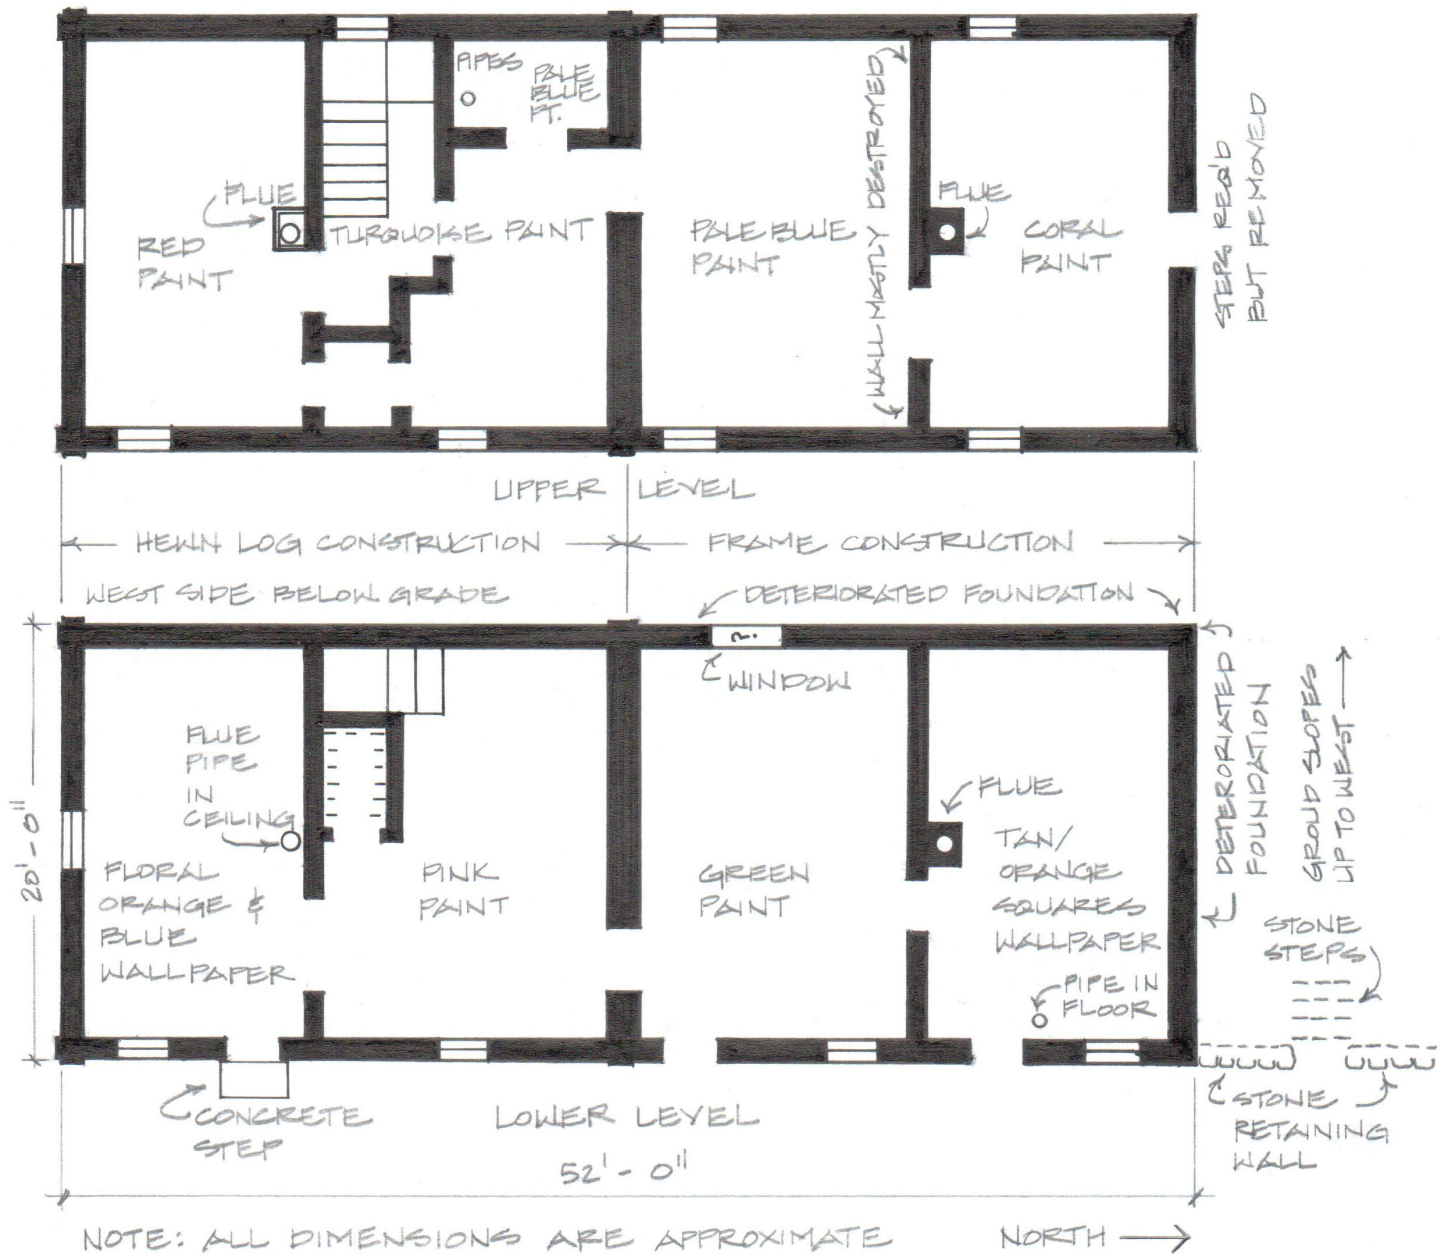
Floor Plan Sketch of the Main House (Karen Pierce, August 29, 2018).
